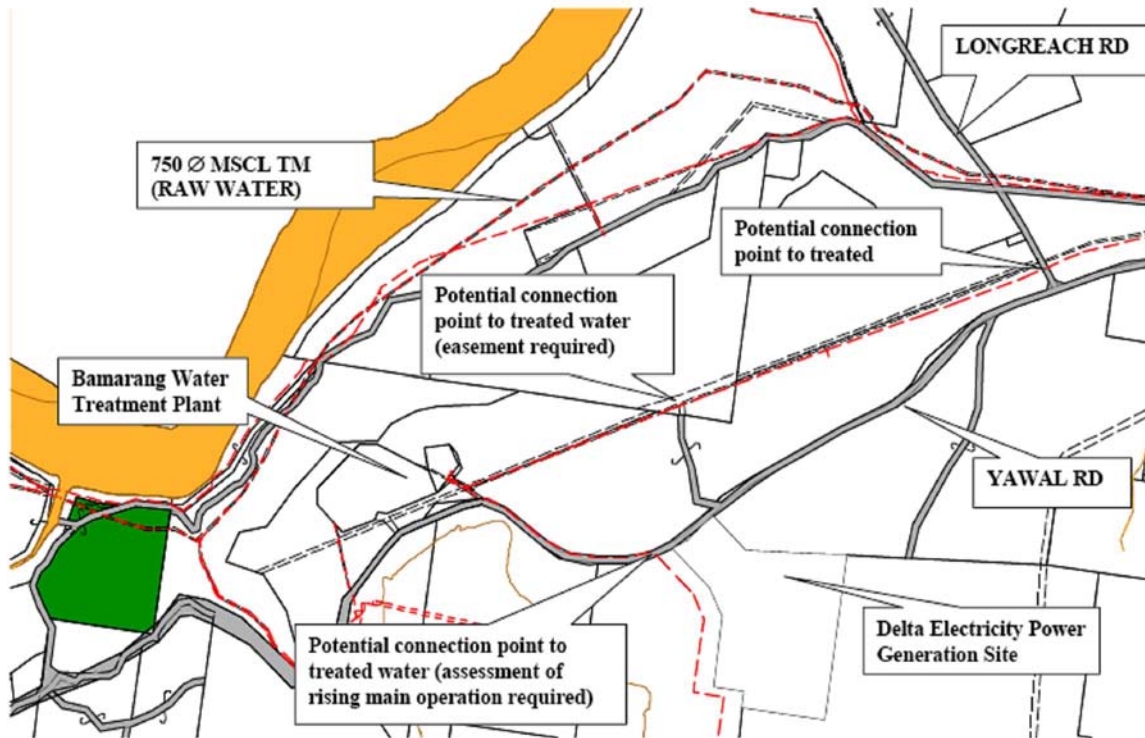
Potential Treated Water Connection Points<sup>2</sup>
